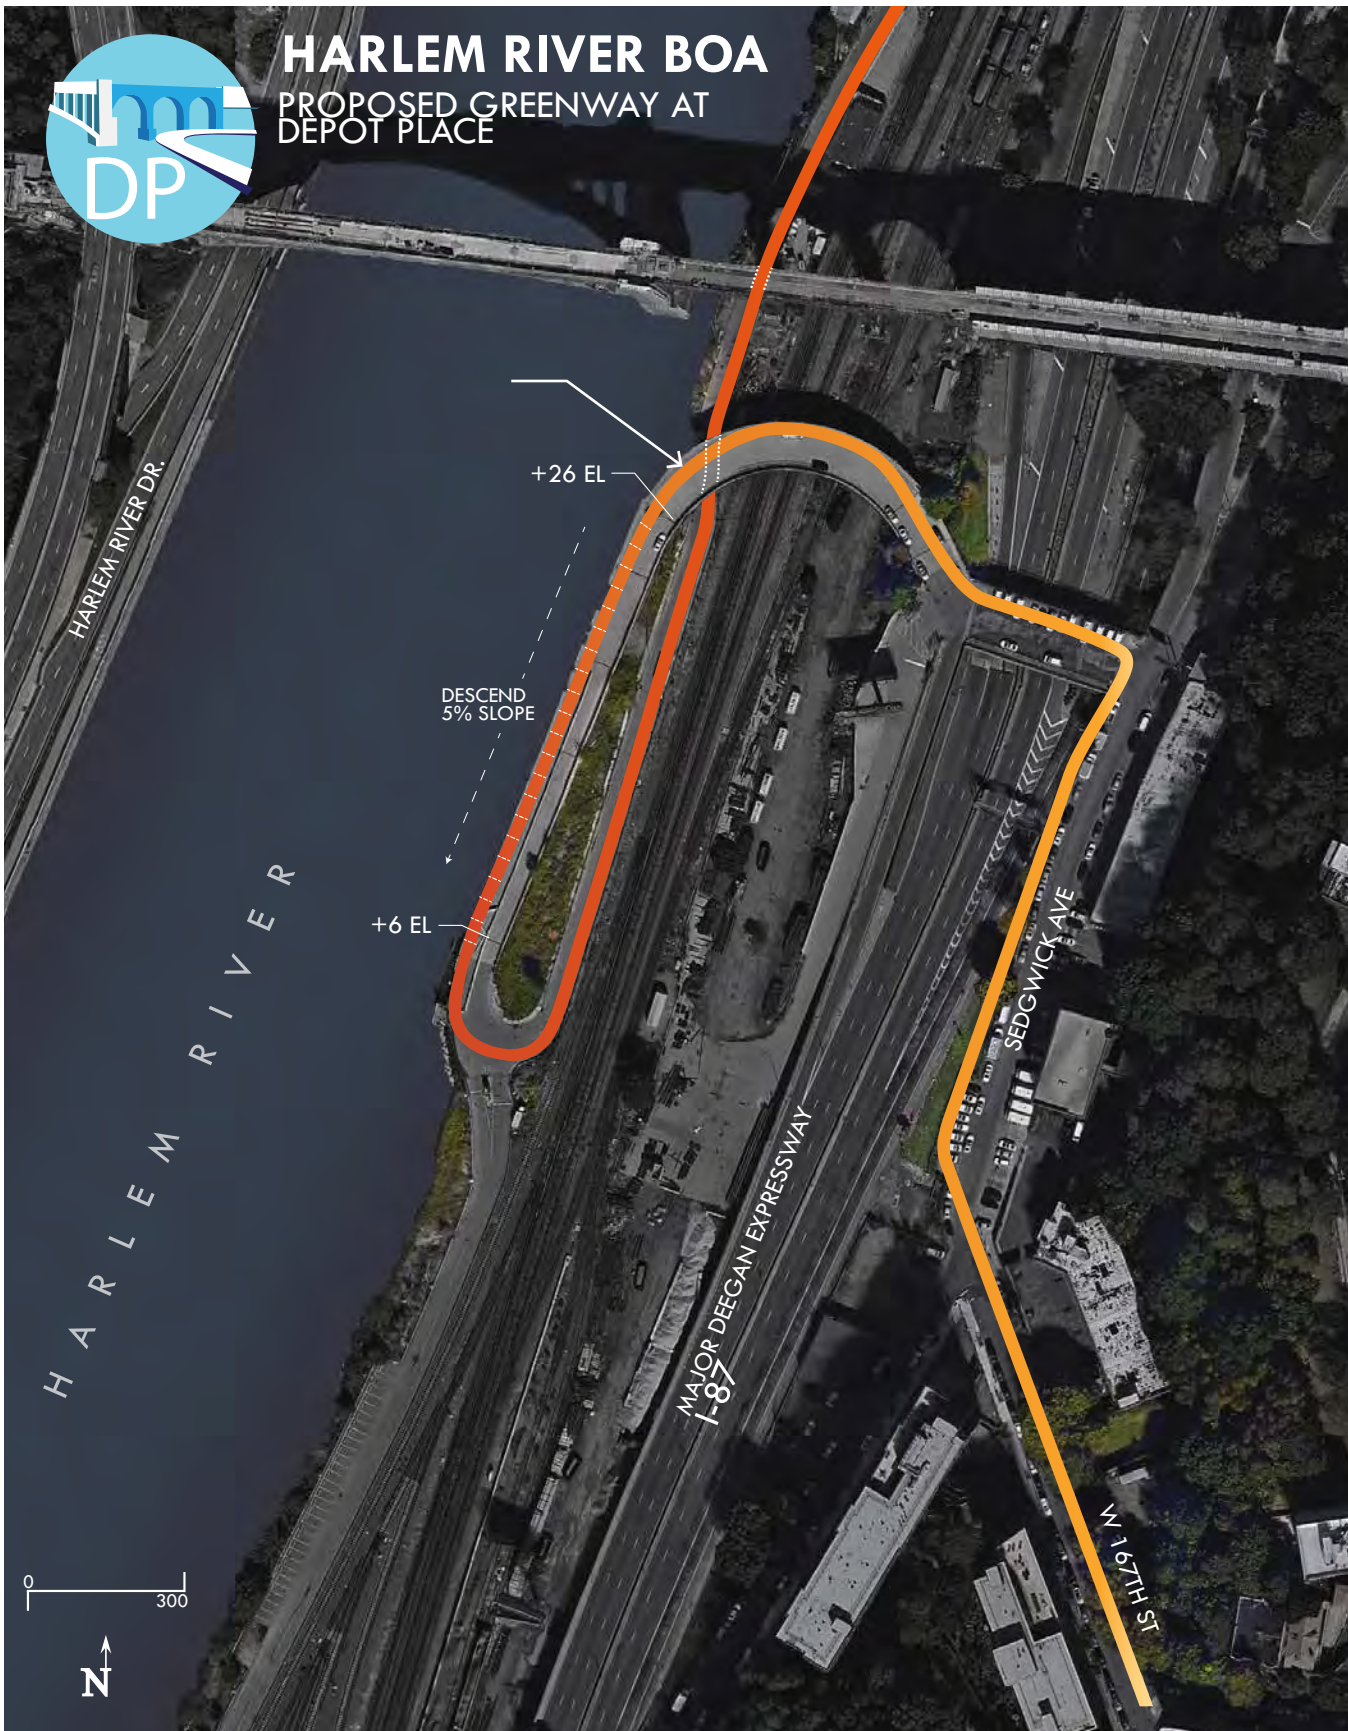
Concept Plan: Proposed Greenway at Depot Place
